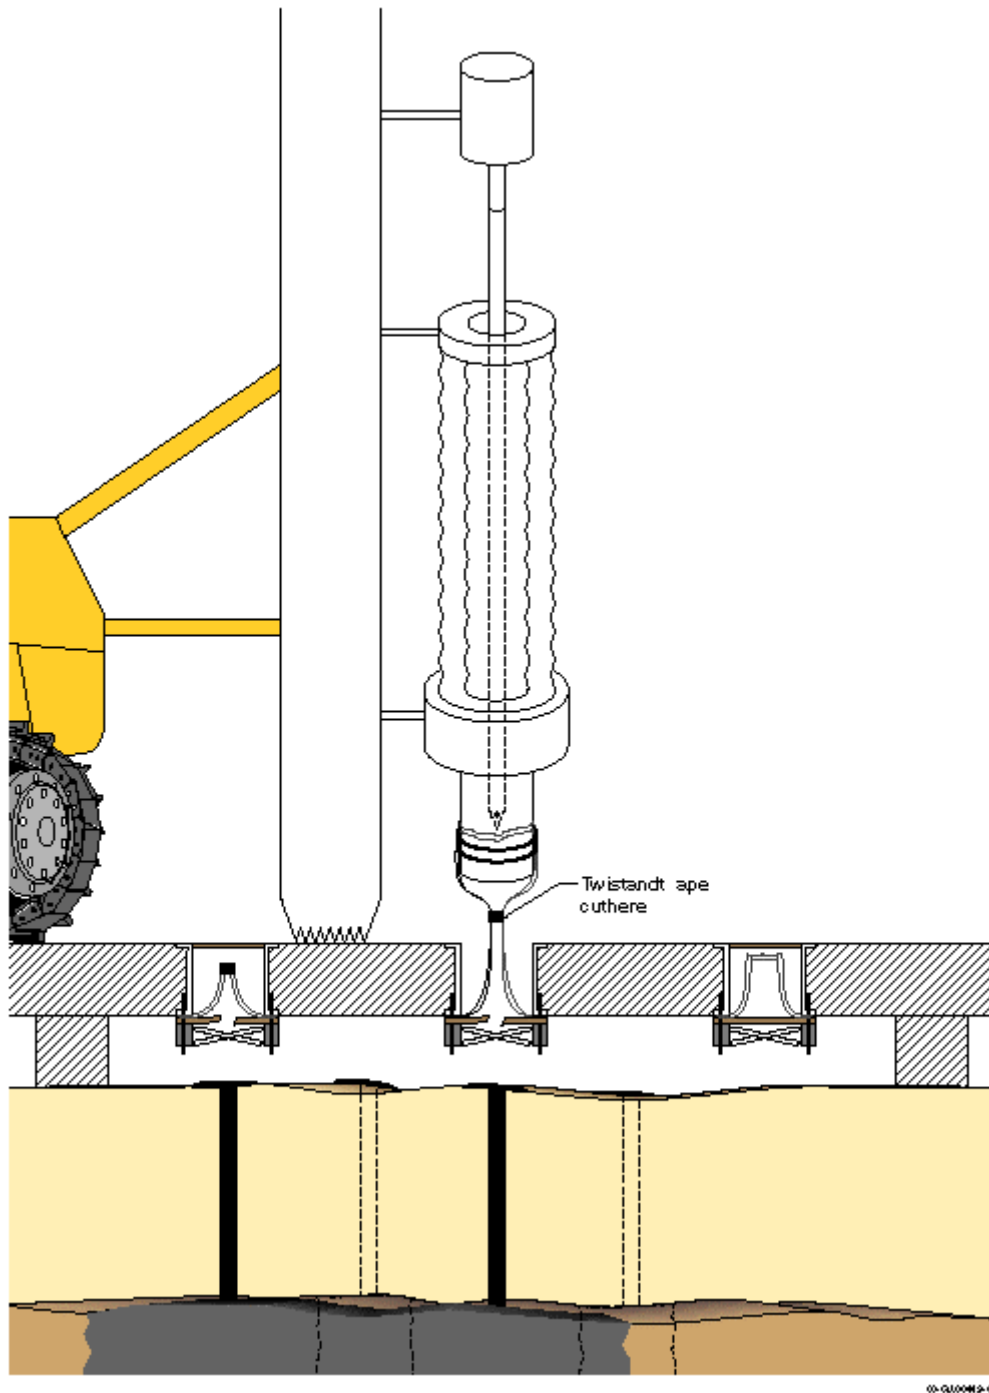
Drill steel withdrawn—preparing for move to a new hole.
